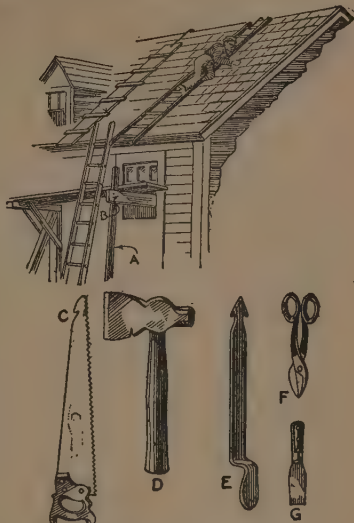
Suggestions for building a scaffold, and some roofing tools.
